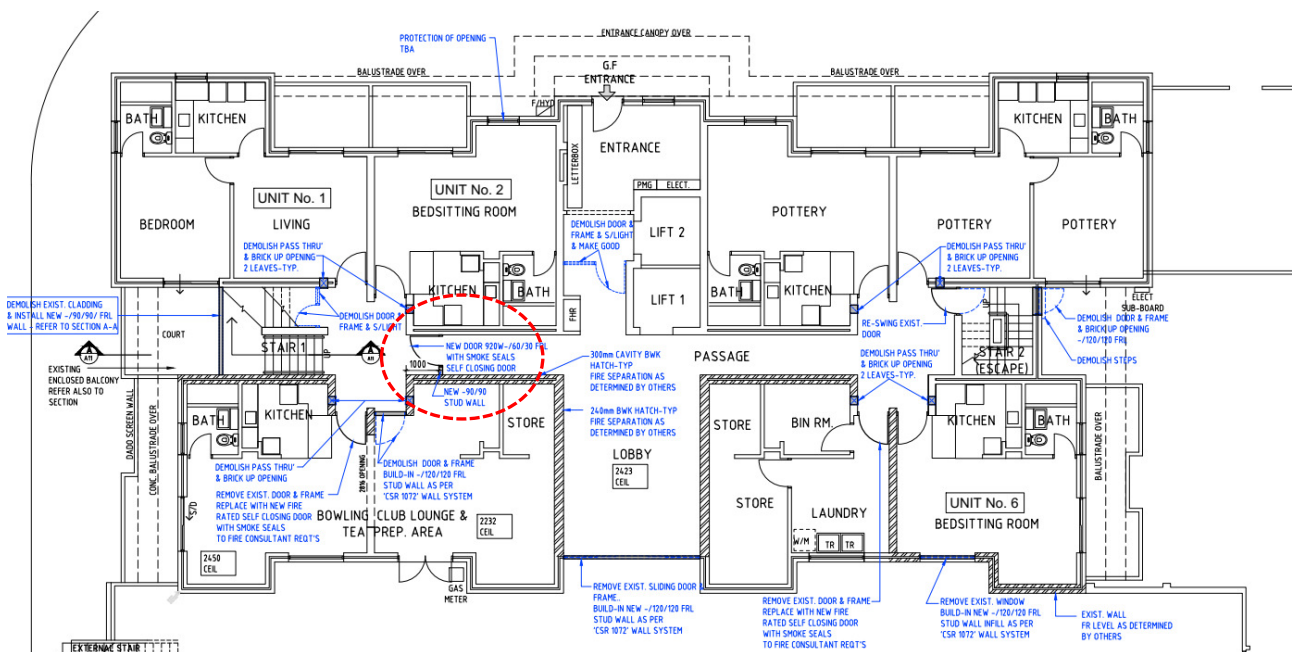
New Enclosure to Staircase (Ground Floor Level)
